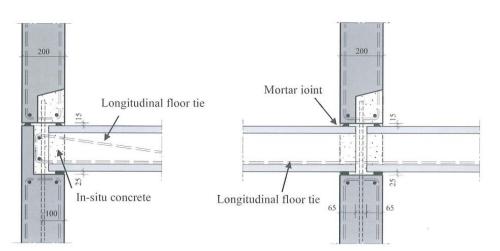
Wall-to-floor connections at intermediate load-bearing walls and hollow-core floor elements for building up to maximum 10 storeys.
